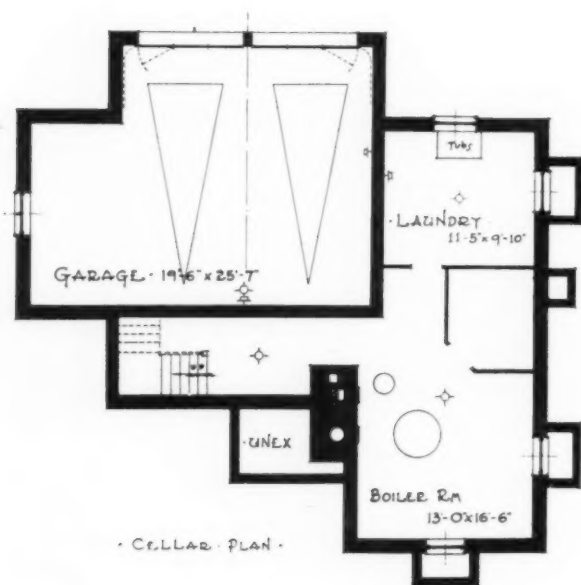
DETAIL OF TYPICAL HOUSE, FOREST HILL SUBDIVISION, CLEVELAND
